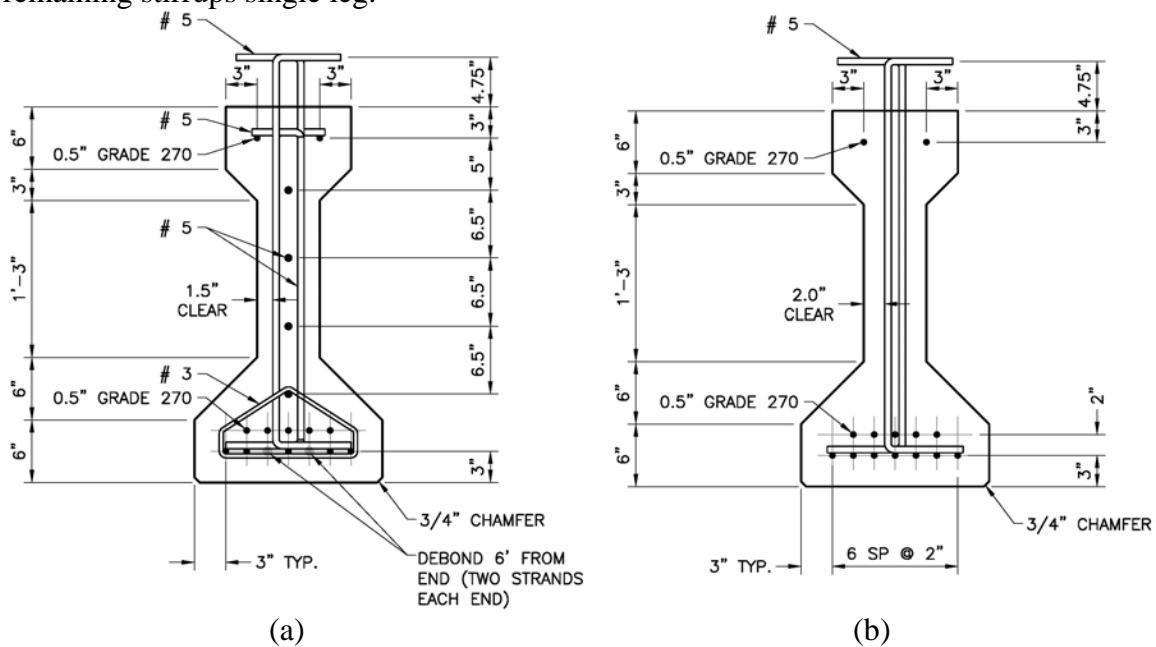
Prestressed beam design detail (a) end section (b) middle section
